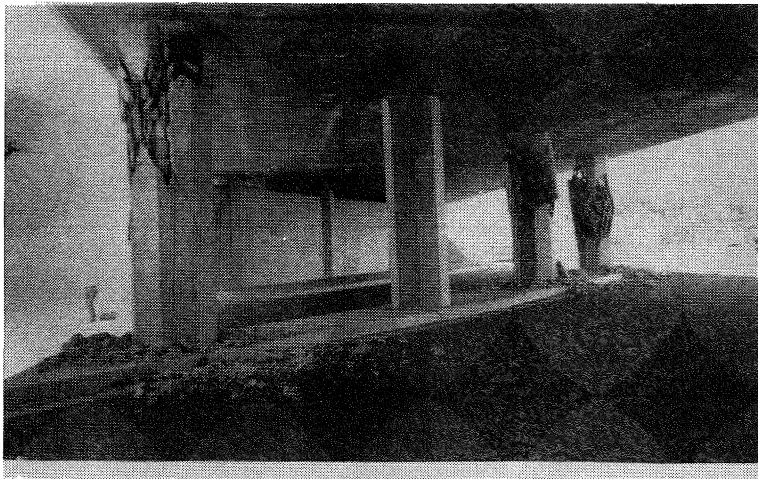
Foothill Boulevard Undercrossing, southeastern bridge, Foothill freeway. Failures were severe in three of the central columns but the columns located between the walls at either end of this bridge were undamaged.
